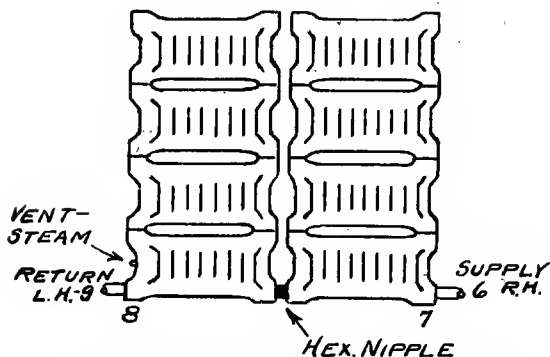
Assembled in two or more stacks. One and two pipe steam only. Bottom feed only.
